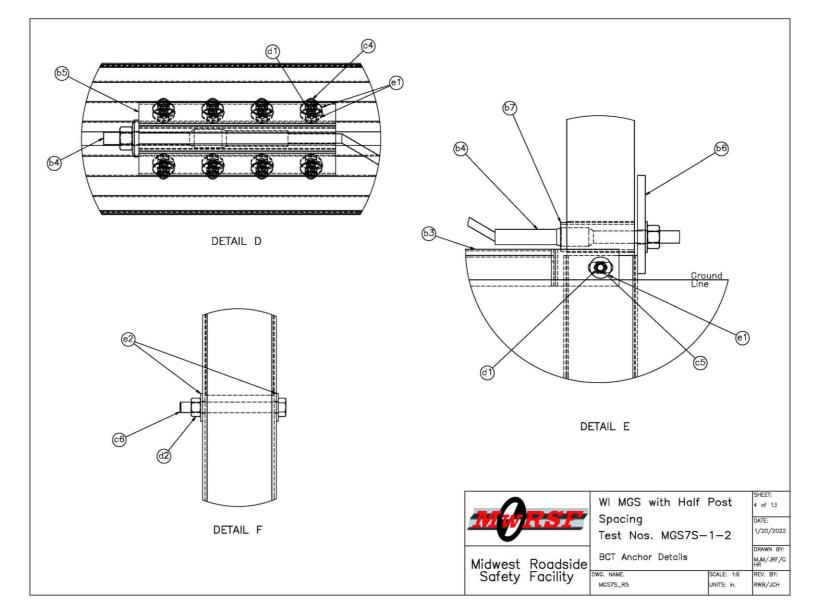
BCT Anchor Details, Test No. MGS7S-1 and MGS7S-2
